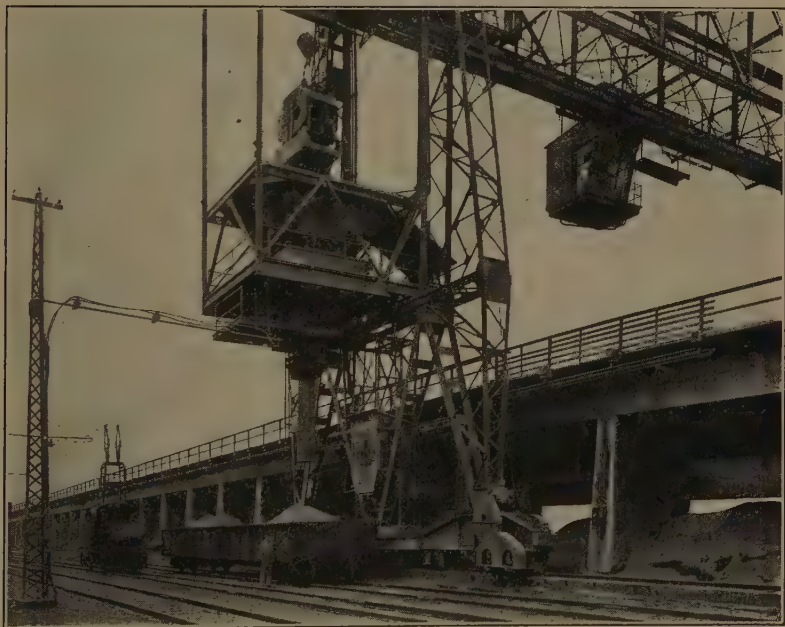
New wharf of Lake Champlain and Moriah Railroad Company at Port Henry, showing concrete trestle and method of loading cars.
